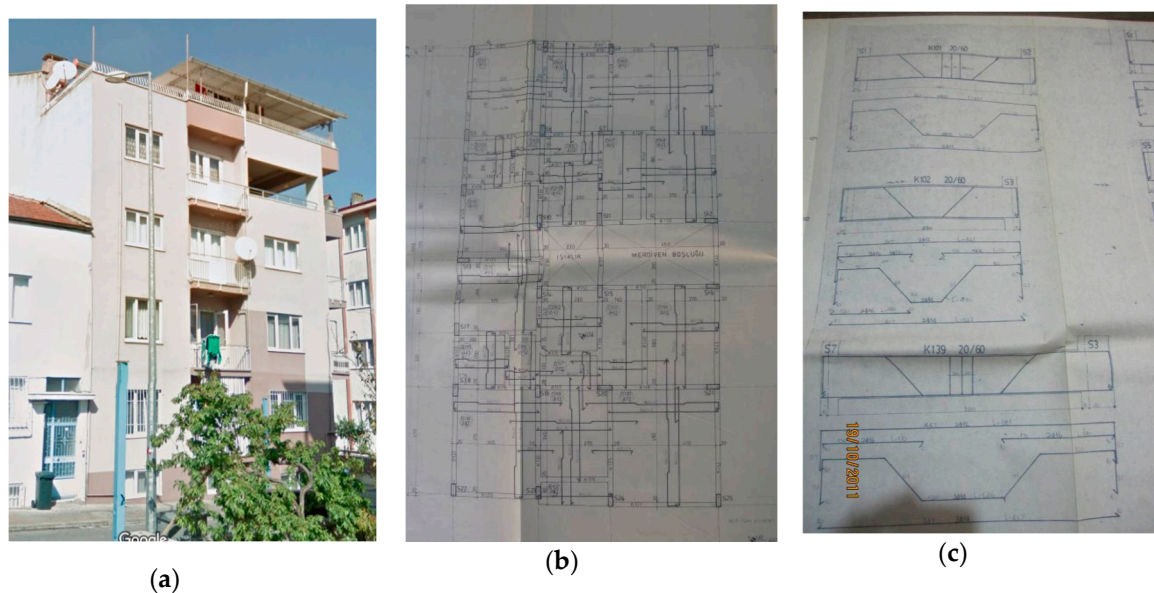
Field investigations and photos of design projects ((a): Building picture, (b): Plan of building, (c): reinforcement details in the RC project).
